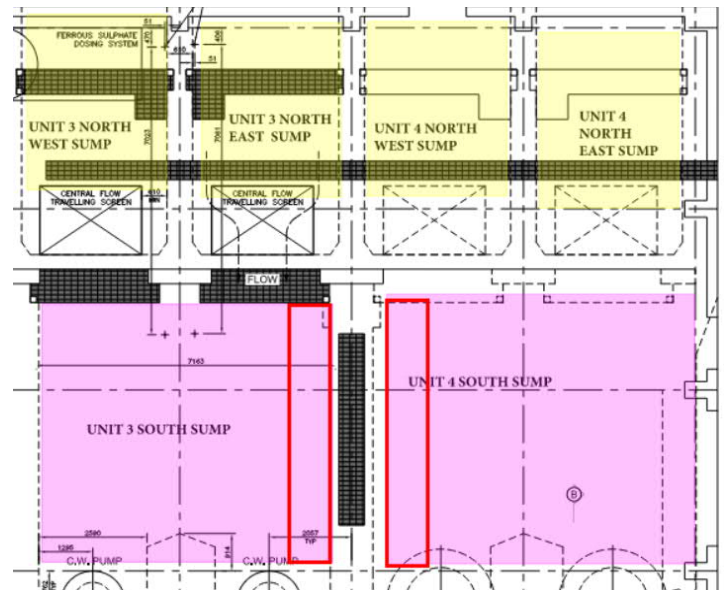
Pump House 2 South Sumps - Location of Significant Cracking in Interior Beams
